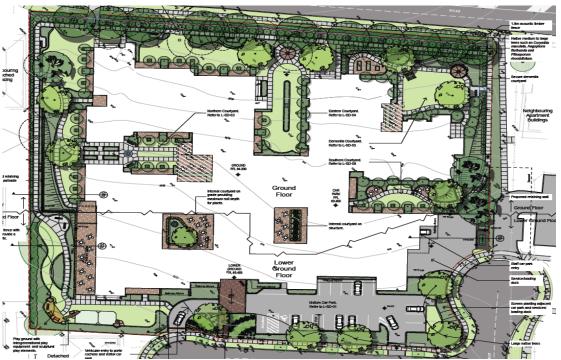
Landscape Concept Plan - Prepared by Arterra Landscape Architects
